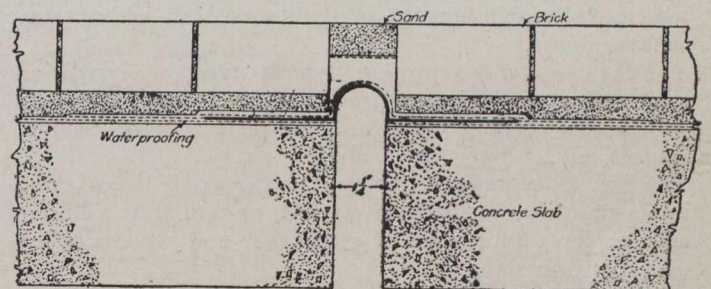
Method of Waterproofing Bridge Slab Expansion Joints.
